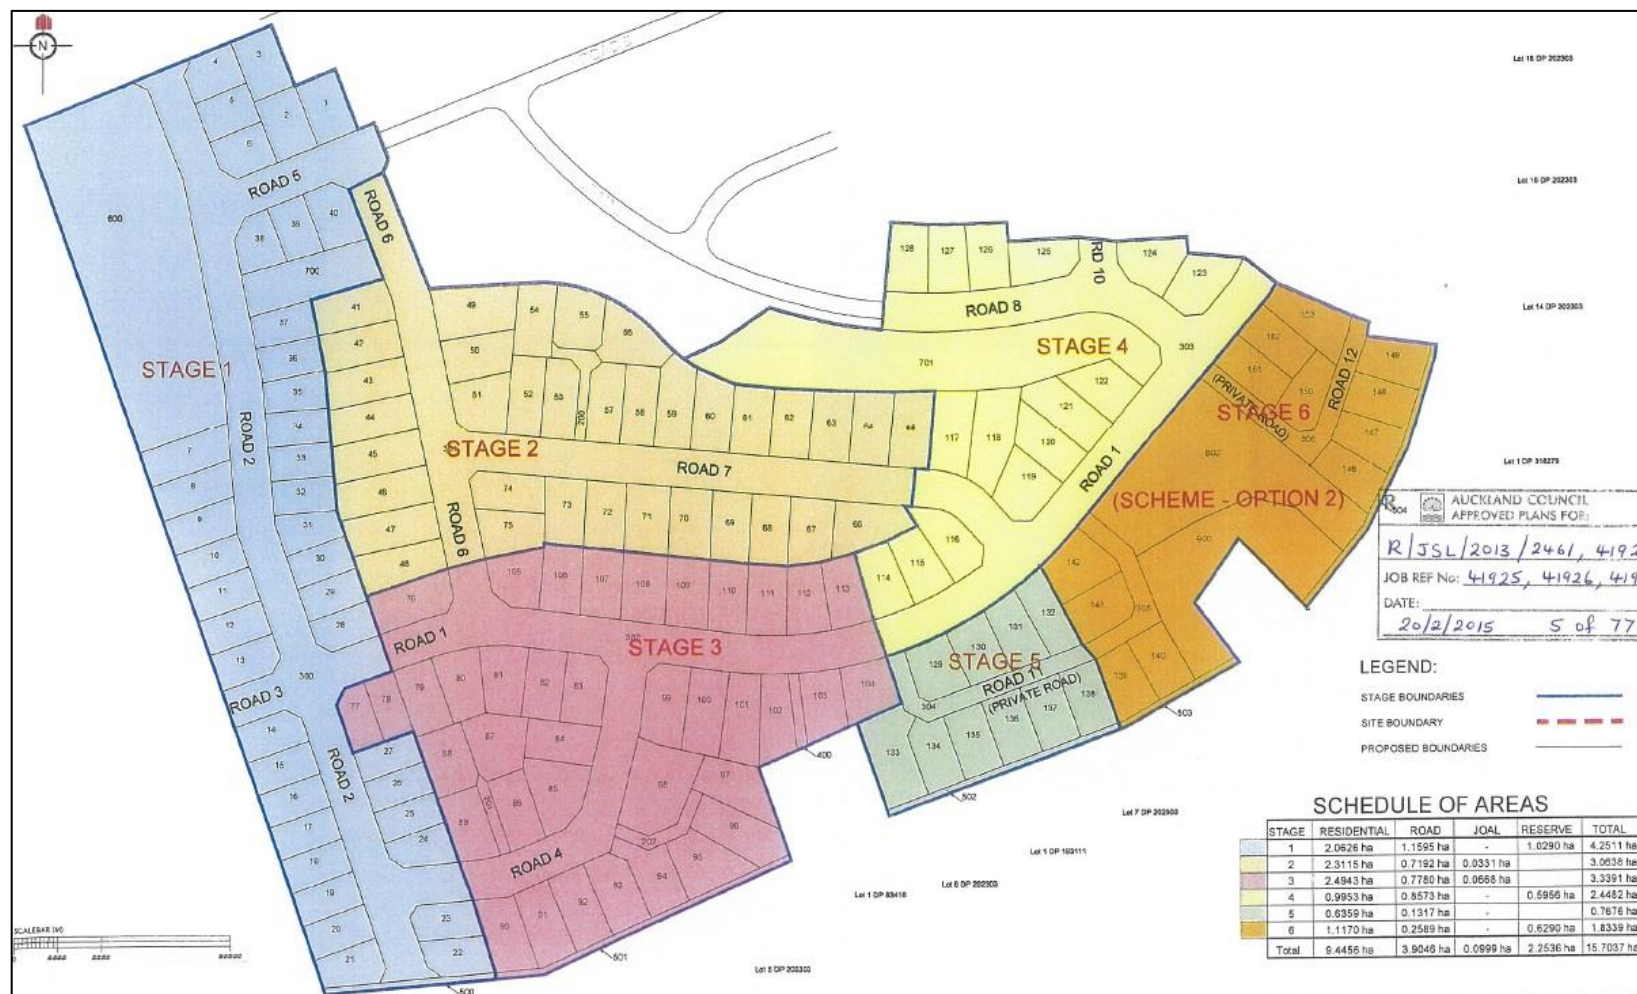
Plan of the consented residential subdivision Stages 1–5 at 949 Old Wairoa Road and 935-973 Papakura-Clevedon Road
